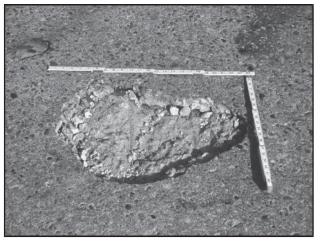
Spalls and Distressed Patches in Span 2 Deck
